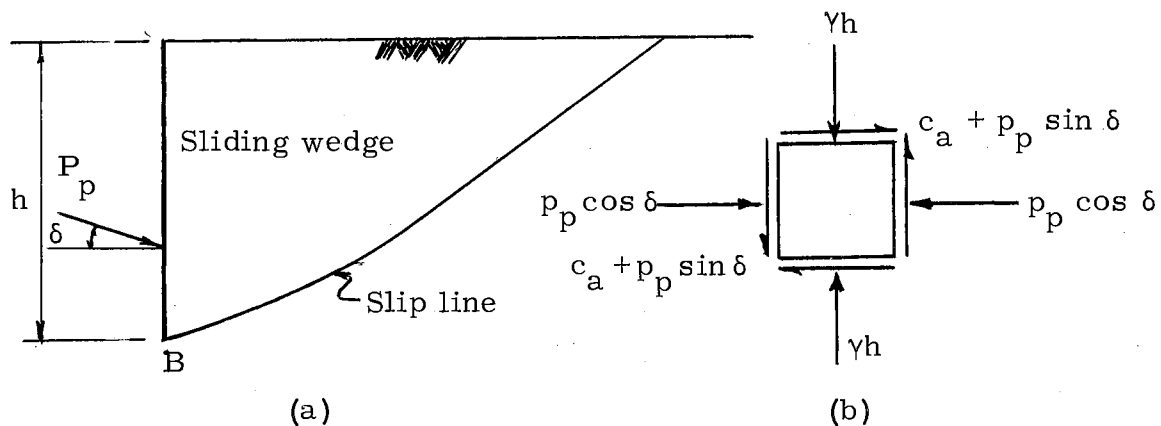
(a) Slip Line in Cohesive Backfill Due to Passive Case of Failure;
